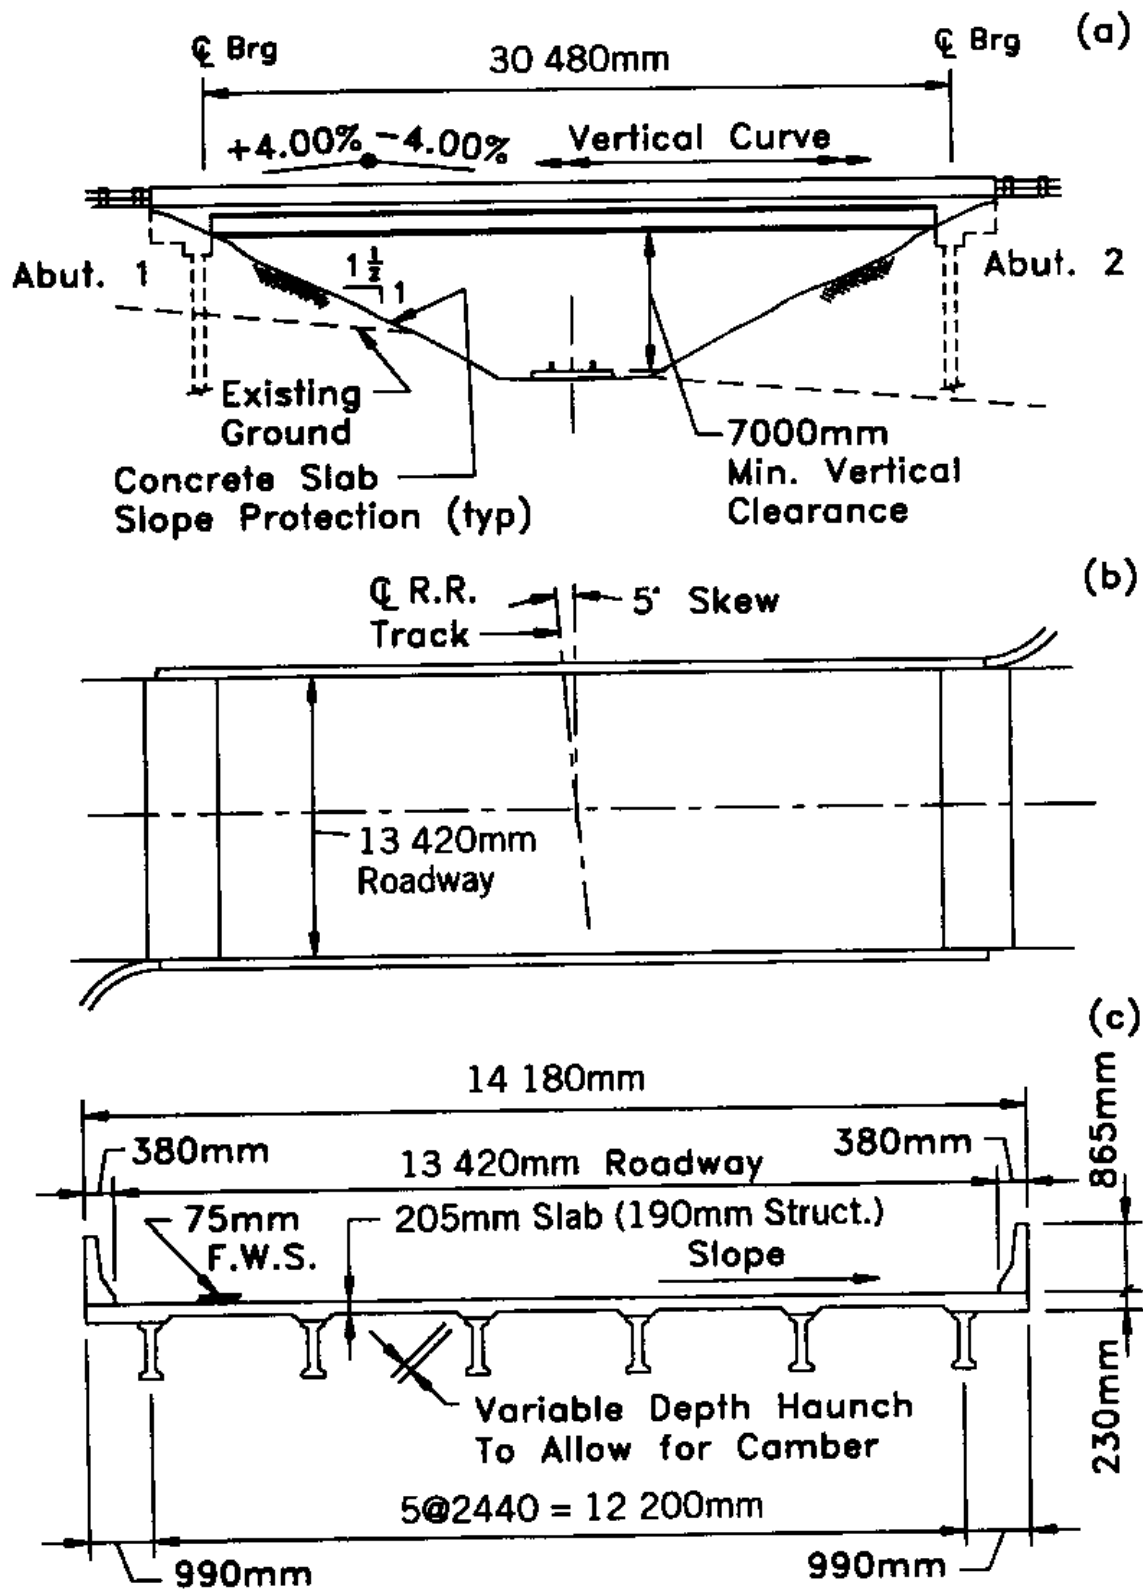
Prestressed concrete girder bridge design example (a) elevation, (b) plan, and (c) section.
